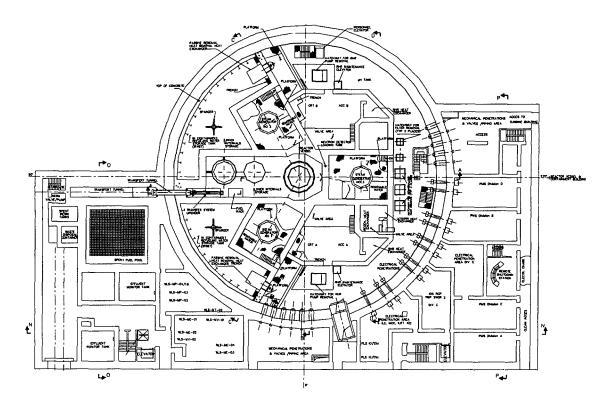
Nuclear island arrangement; plan view at operating floor elevation
